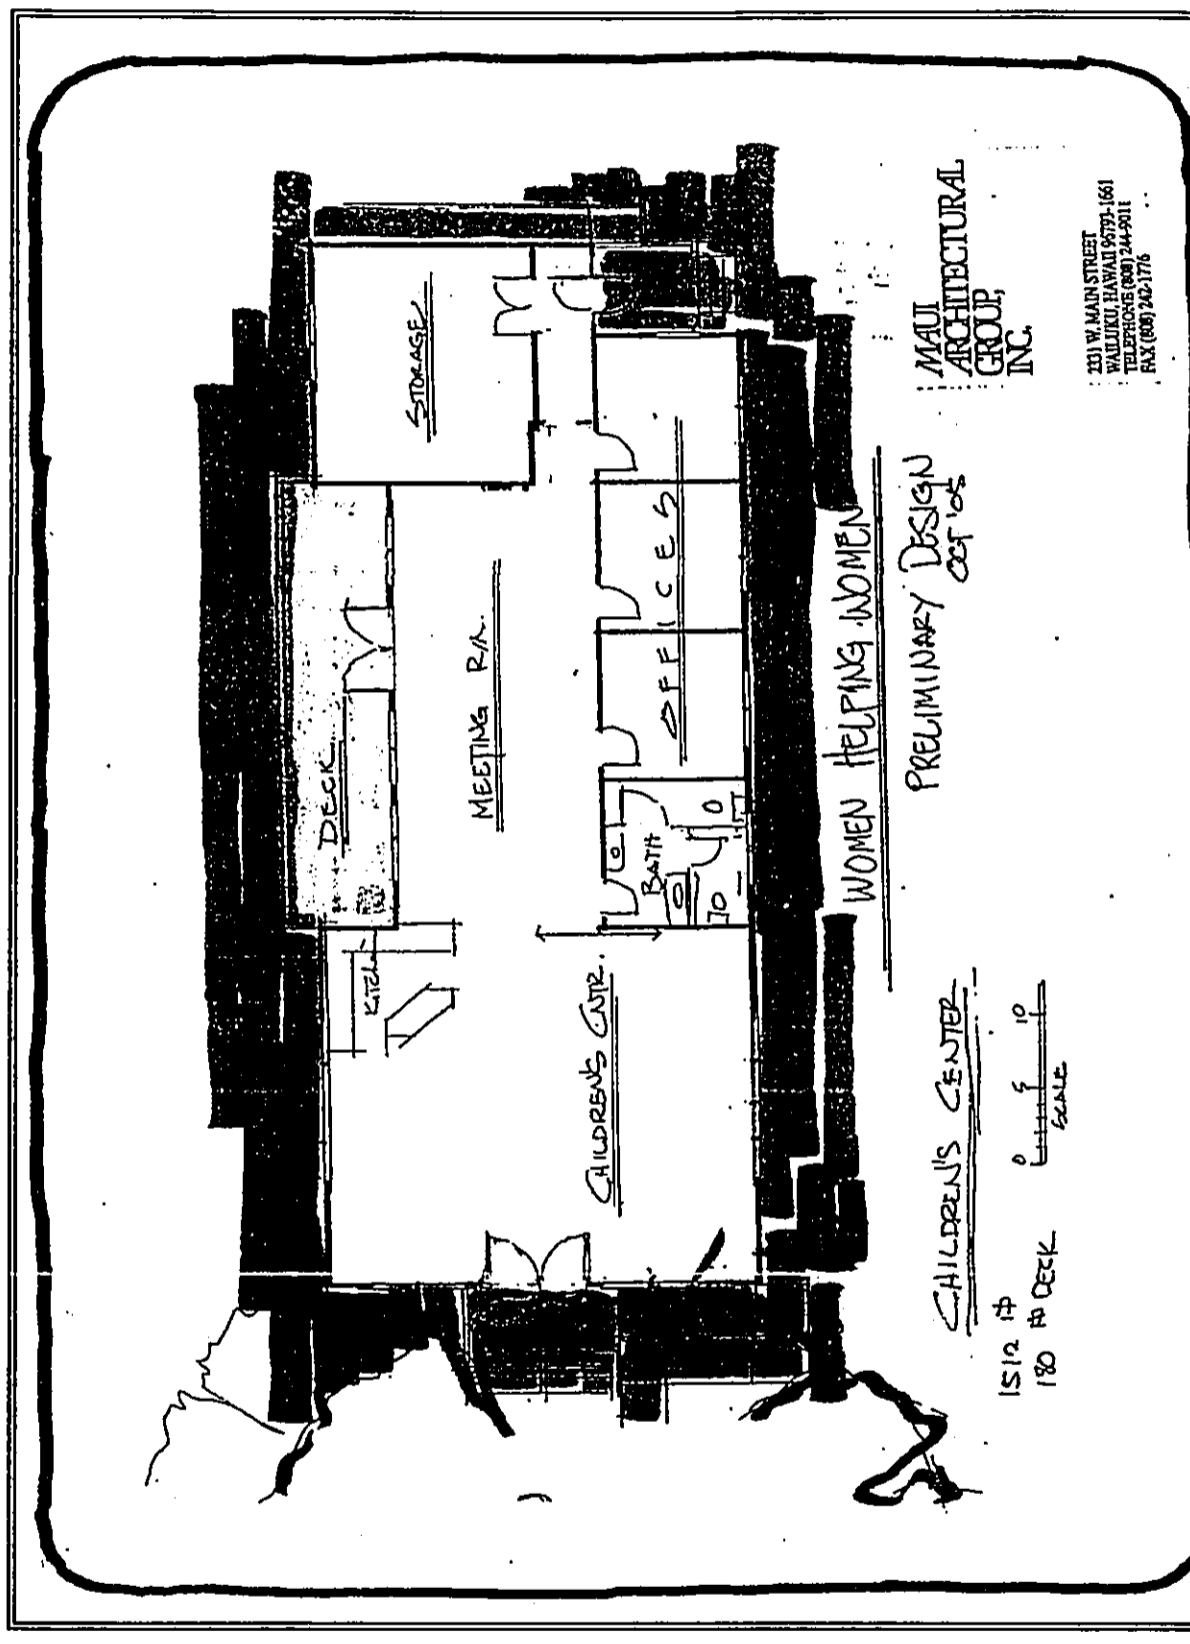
FIGURE II.e – Floor plan of proposed Children's Center; for more detailed drawings please refer to Appendix D.
